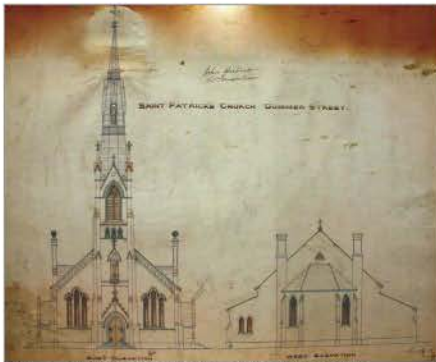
ST. PATRICK'S CATHOLIC CHURCH, TORONTO, ARCHITECTURAL DRAWING – FAÇADE AND REAR ELEVATION, GUNDRY AND LANGLEY, ARCHITECTS. | COURTESY OF TORONTO PUBLIC LIBRARY, BALDWIN ROOM.
